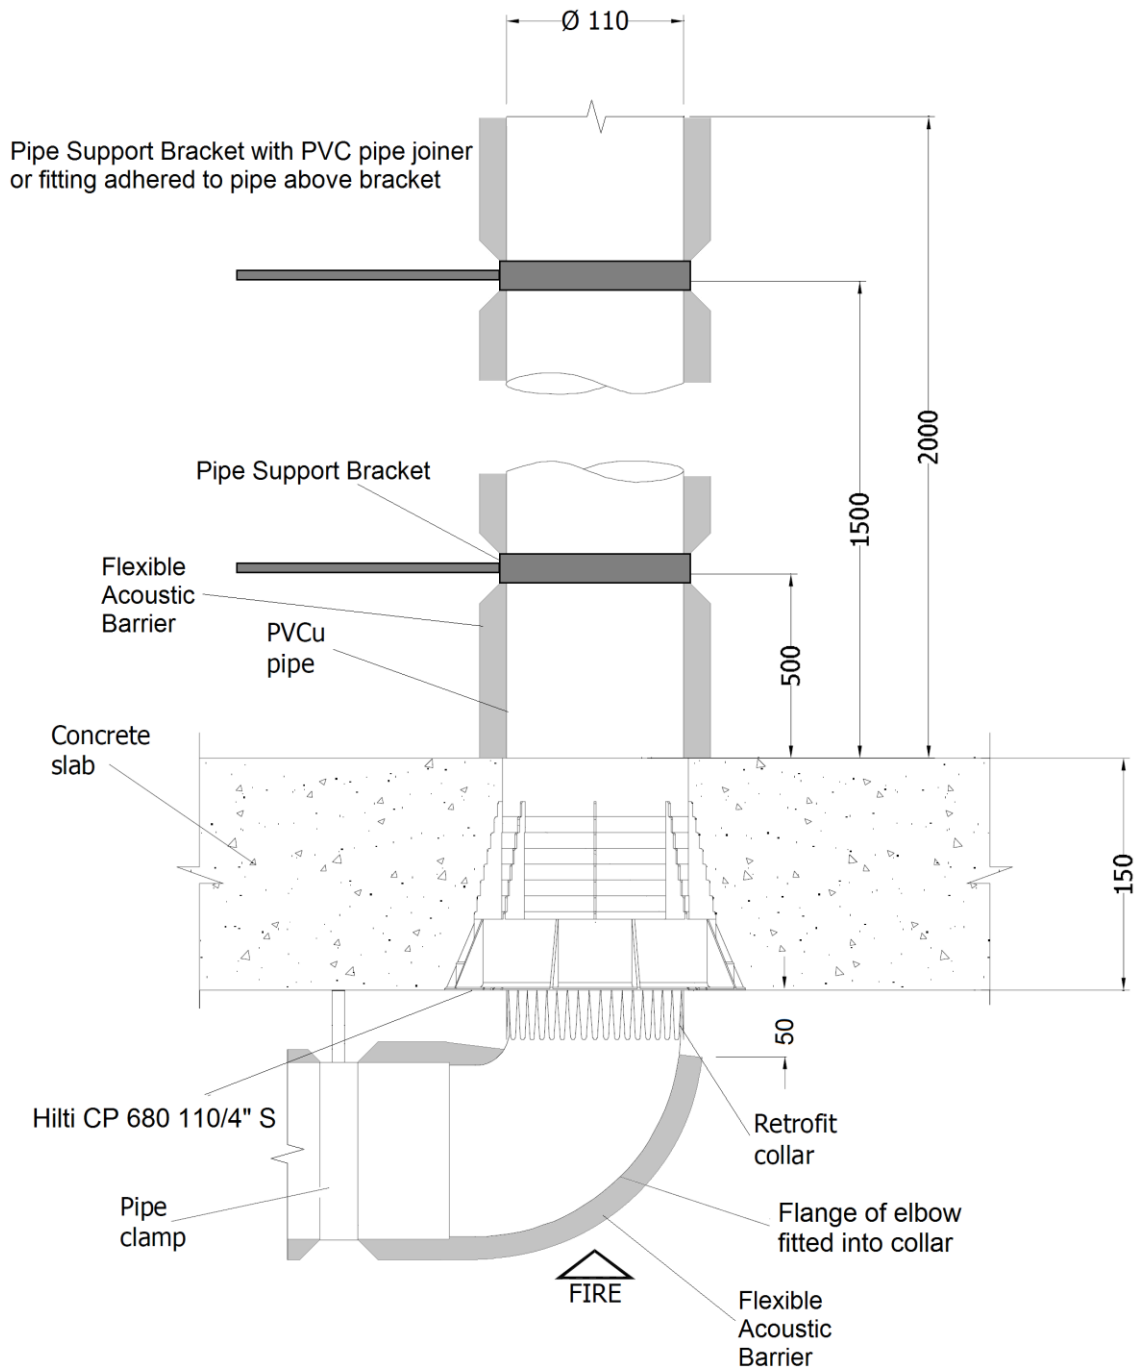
uPVC pipes flange of elbow fitted into firestop collar protected with Hilti CP 680 110/4" S + CP 680 N-RAD Cast-In Firestop Collar System without Ultrafloor, optional flexible acoustic barrier at least 50mm from underside of concrete slab
